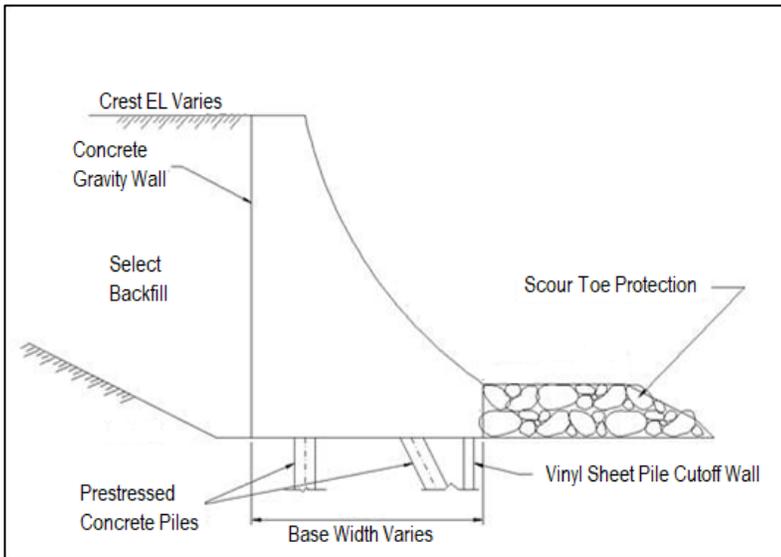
Typical Concrete Gravity Wall (USACE 2009)
